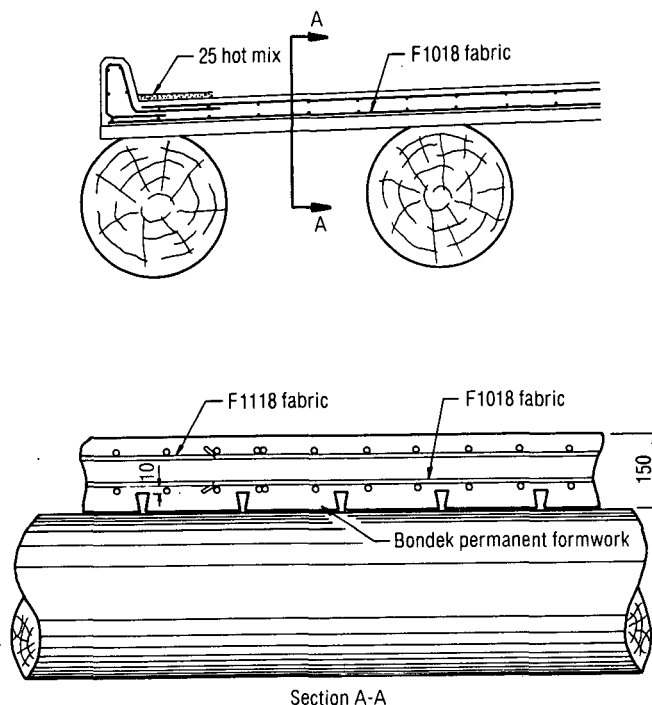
CONCRETE DECK ON TIMBER STRINGERS
